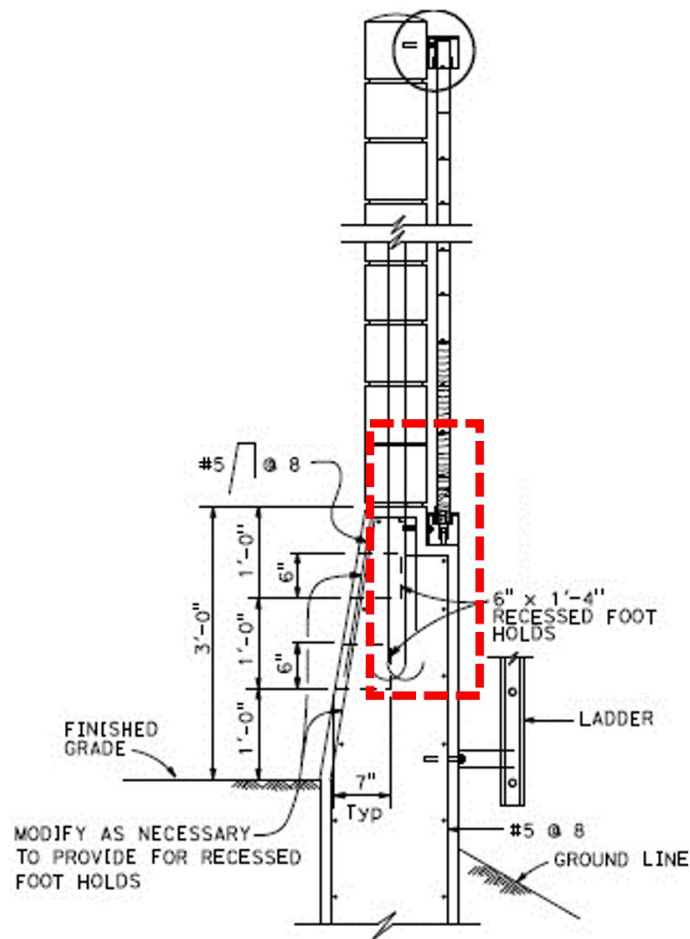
Example of Modification to Barrier Shape and Rebar Due to Installation of Access Door
